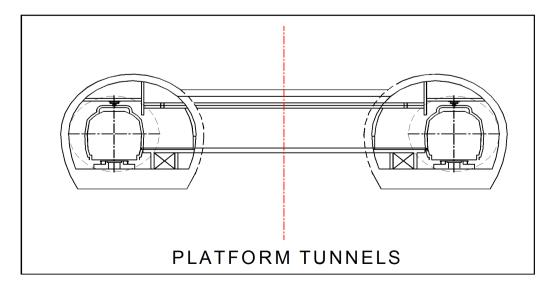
CONSTRUCTION OF TUNNEL BY NATM
